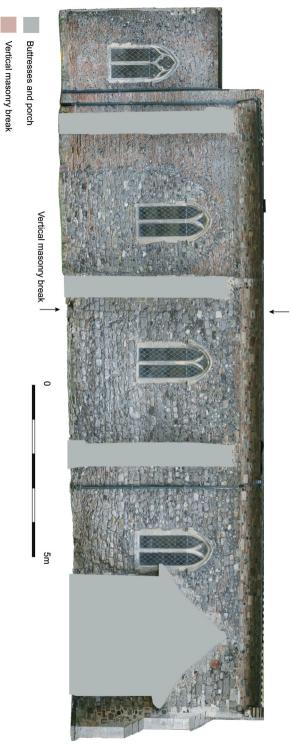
Rectified photography of the north wall of the nave of St John the Baptist; arrows indicate the break in masonry west of the central buttress.
